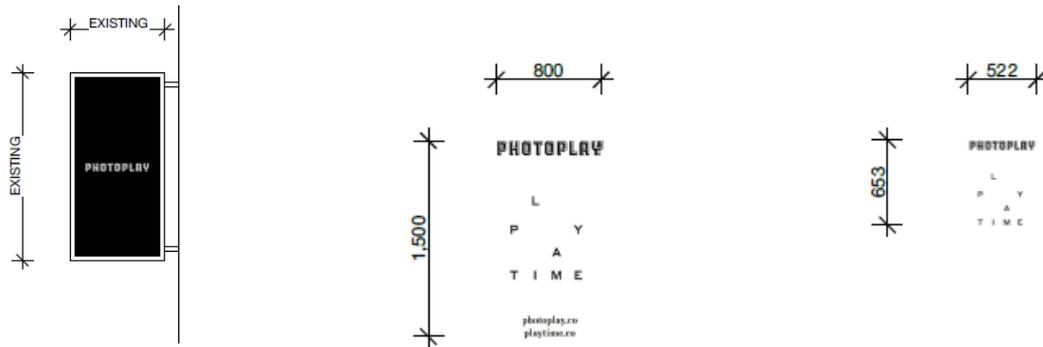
Proposed signage – existing projecting wall sign to be replaced on left, proposed window sign in the centre, and proposed wall sign on right.
